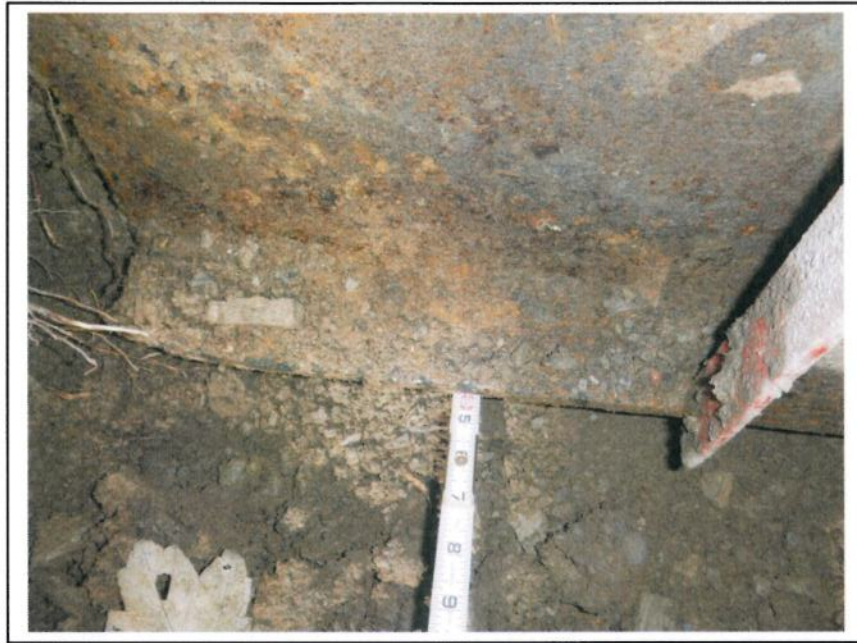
Beam 4 Loss of Bearing at Near Abutment
